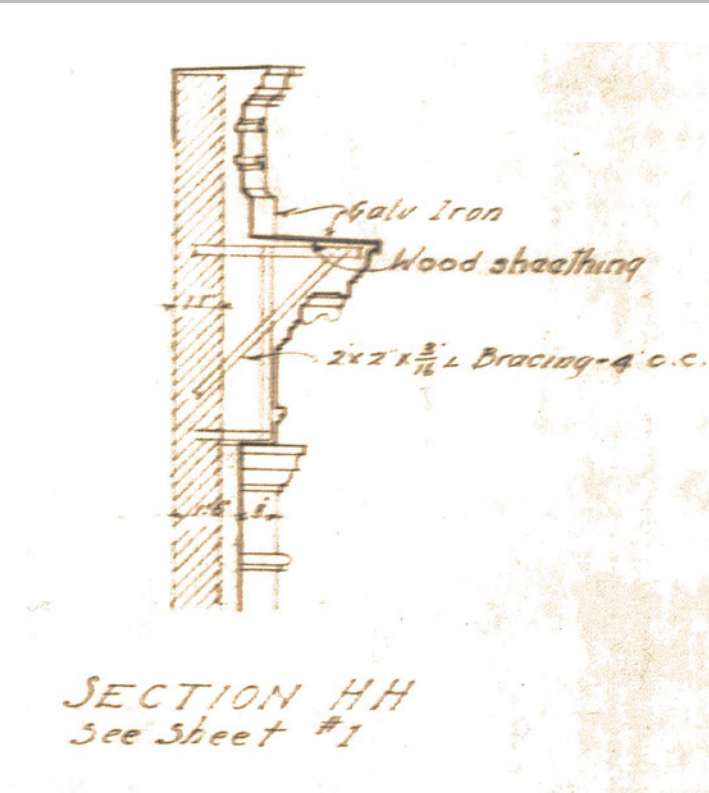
Original Phase III - 1917 Dubois Drawing, Indicating the Galvanized Cornice and Armature Detail at the East Wing, Looking North.
